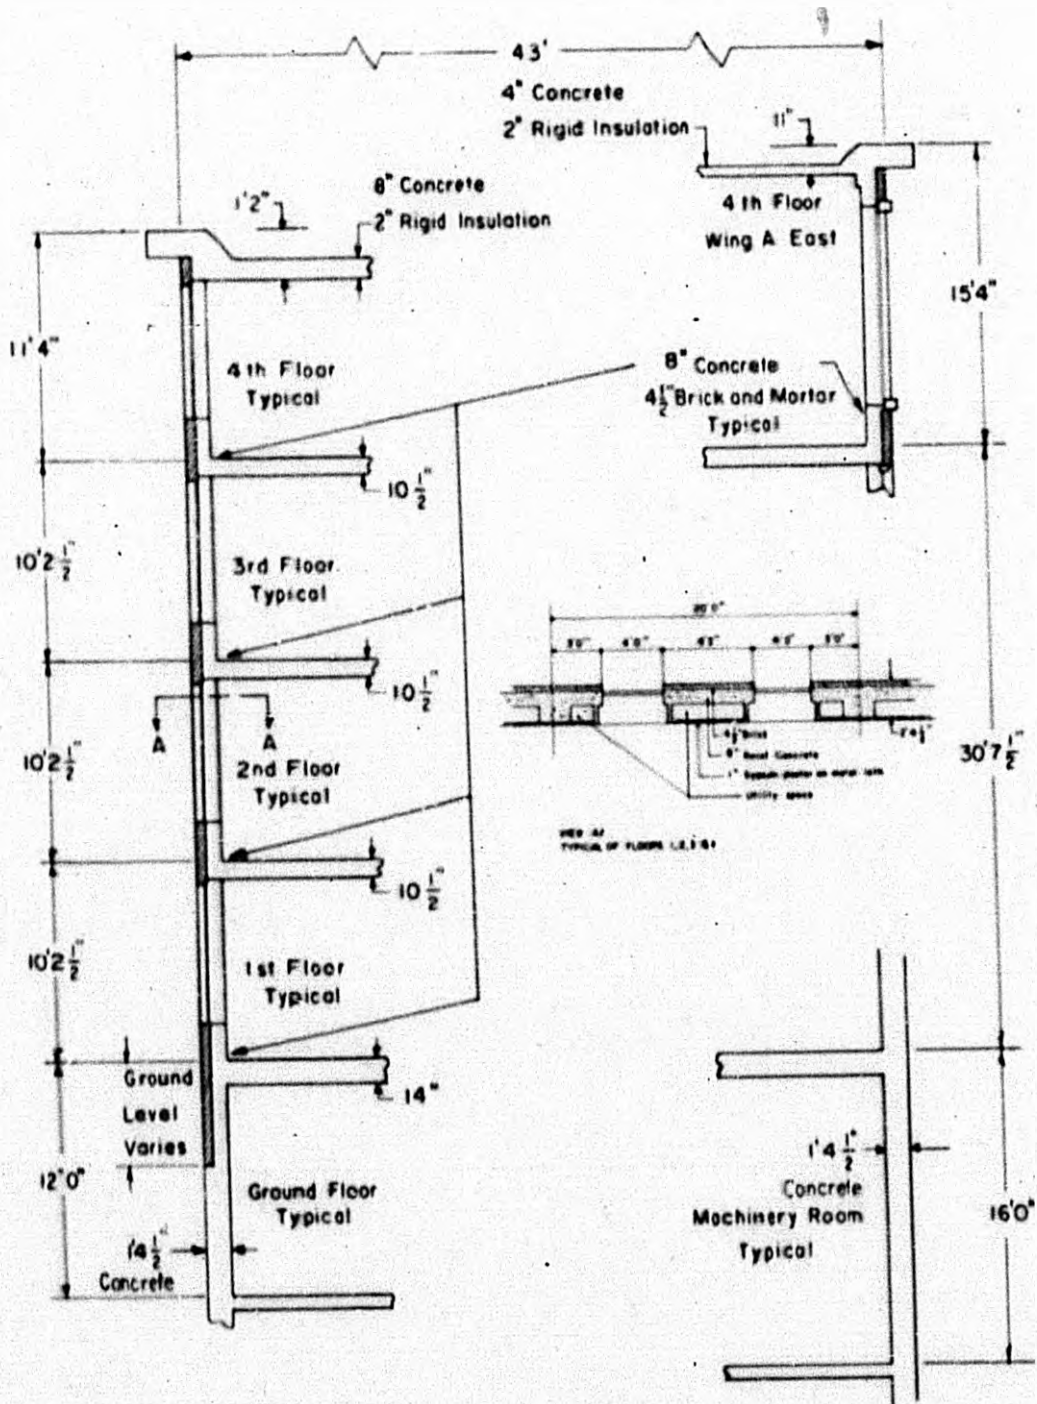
Sectional view of building, illustrating floor and wall thicknesses and elevations.
